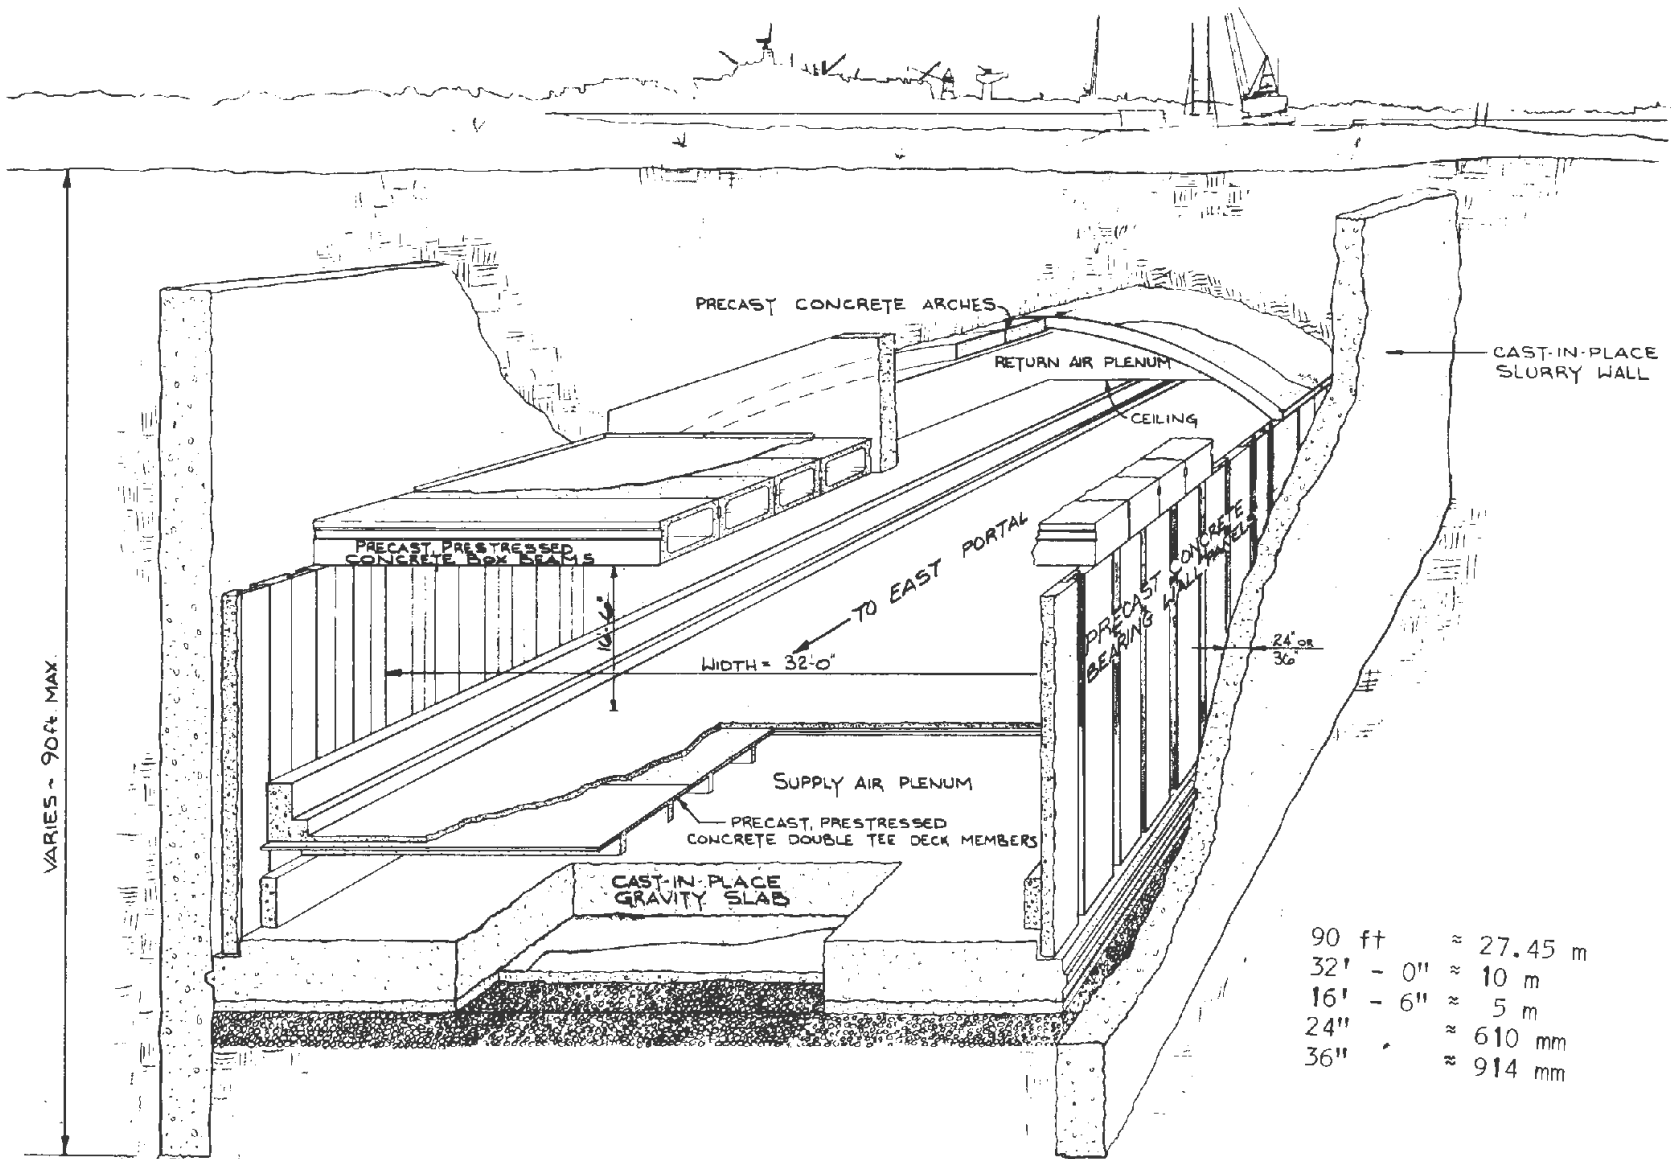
Schematic drawing of Case Study 3, a cut-and-cover approach to a river tunnel, showing proposed construction using prefabricated structural members.
